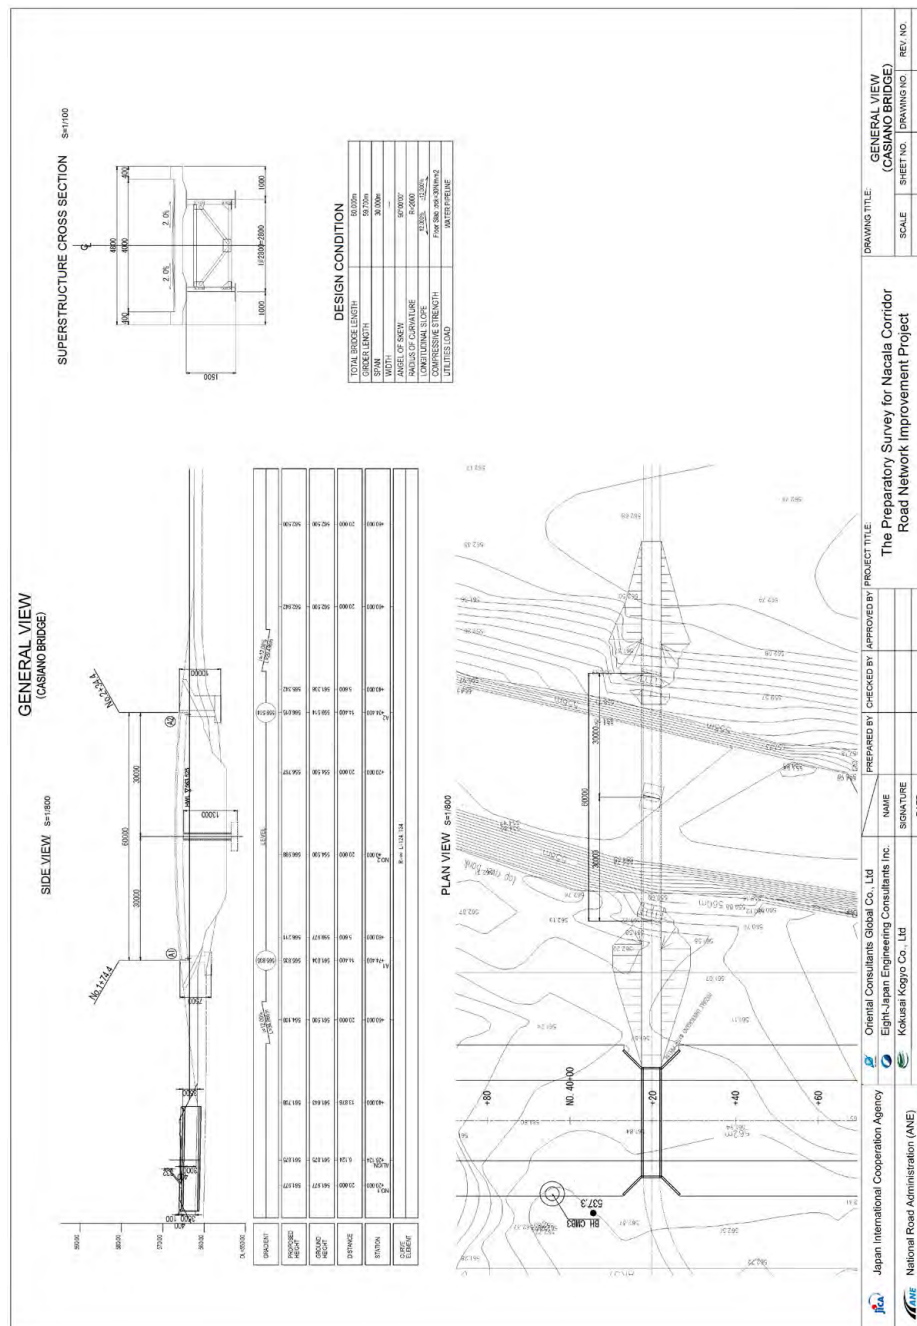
Cuamba Bypass Road – Cassiano Bridge
